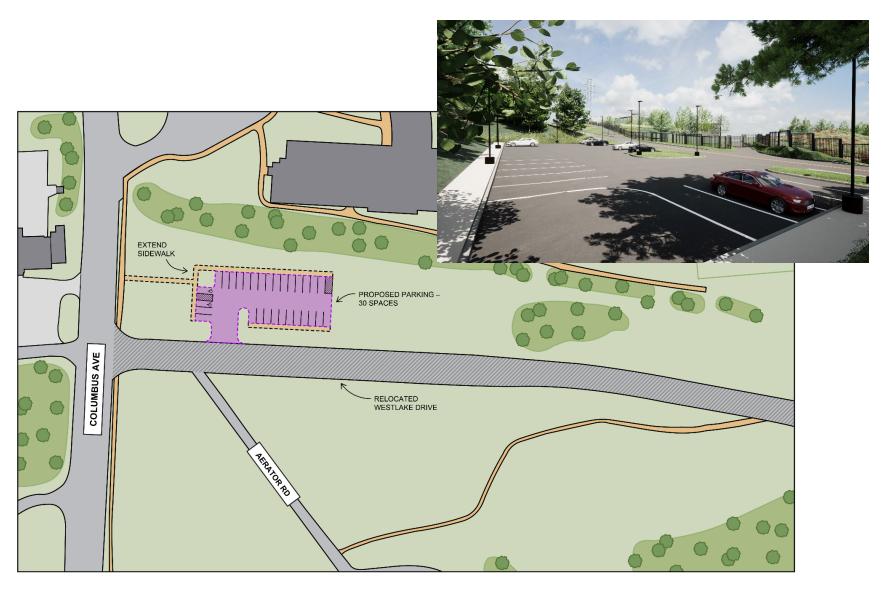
Proposed Parking Lot on Relocated Westlake Drive – Plan and Rendering
